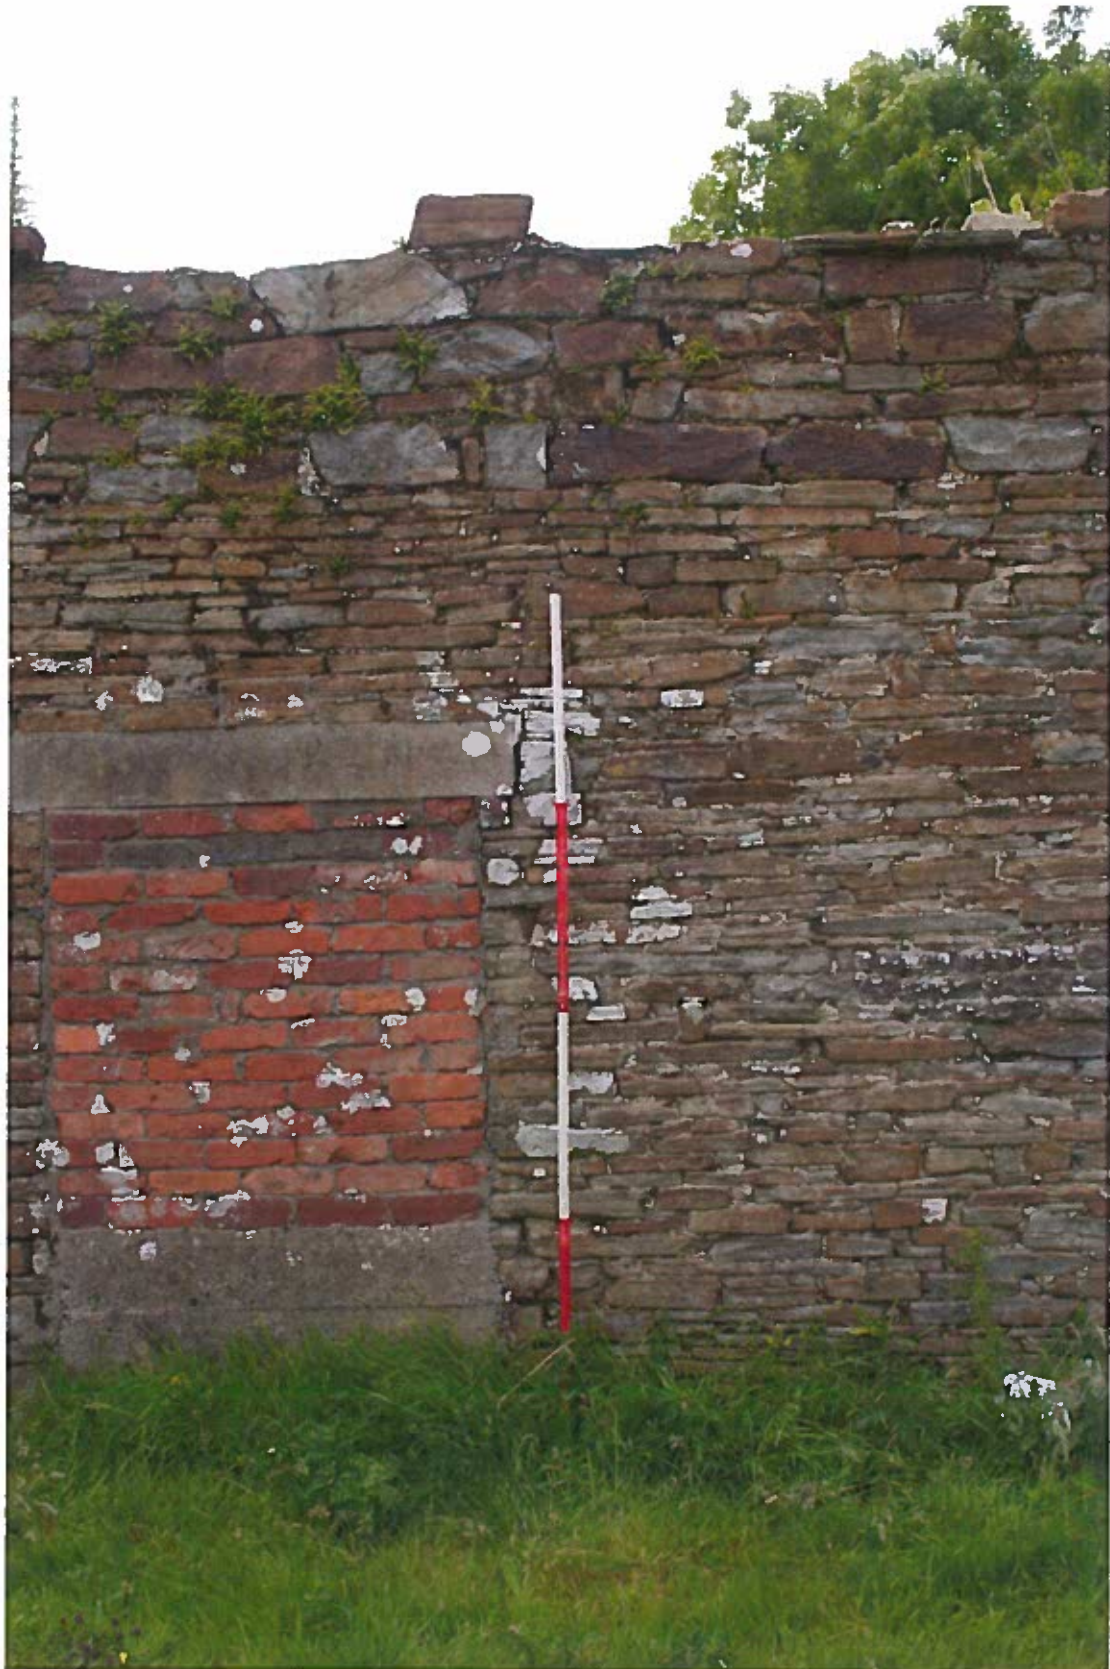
Extension wall from southeast blocked door/window to left. Shot 5.
